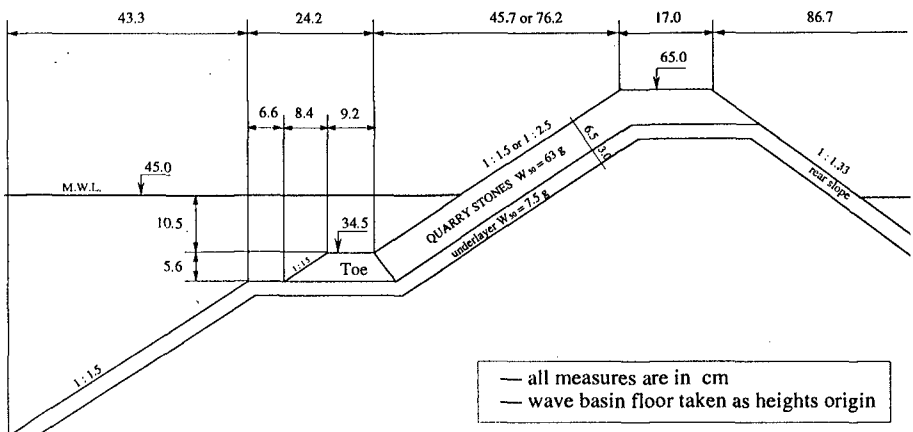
Cross-section of breakwater (slope 1:1.5).
